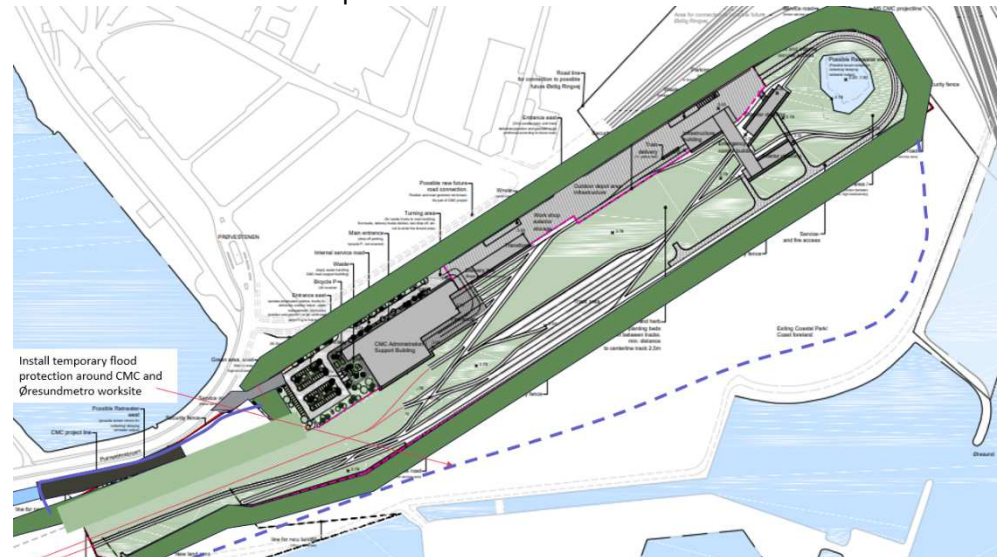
Phase 6 - Øresund metro Ramp Construction Sequence.
